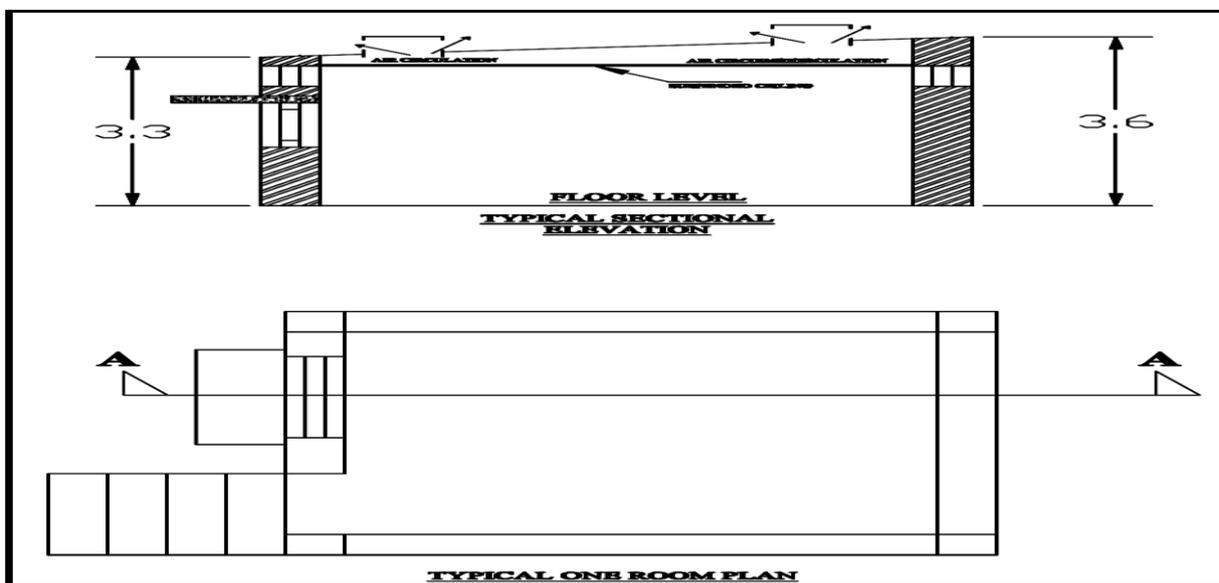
“one window, two ventilators, roof dormers & suspended ceiling”
